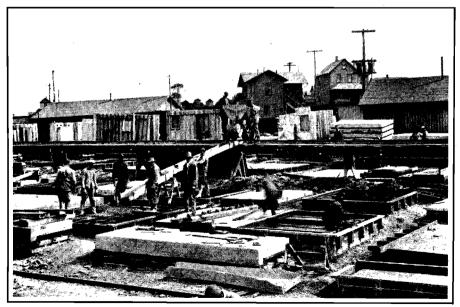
Concrete was chuted from a sidegate car on the trestle track into wood or concrete forms.
